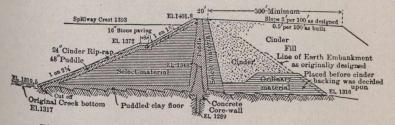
Maximum Cross Section of Hinckston Run Dam.
